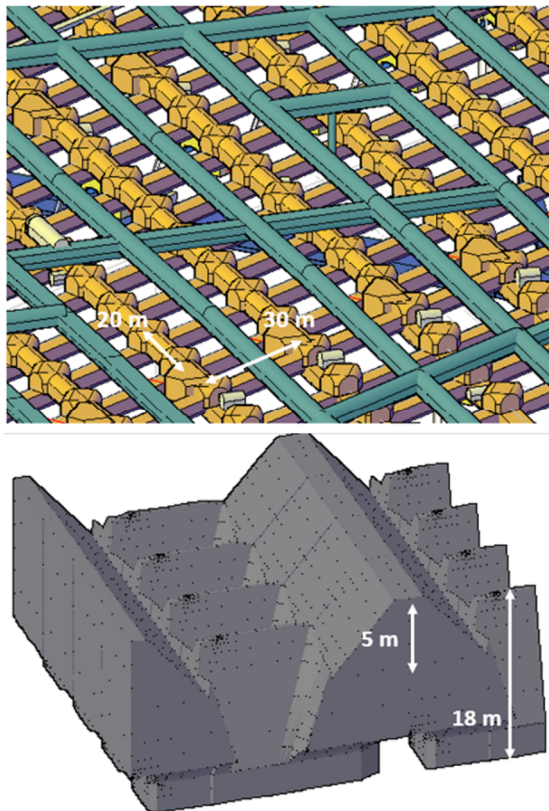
Extraction level layout and pillar dimensions in Recursos Norte mine.
